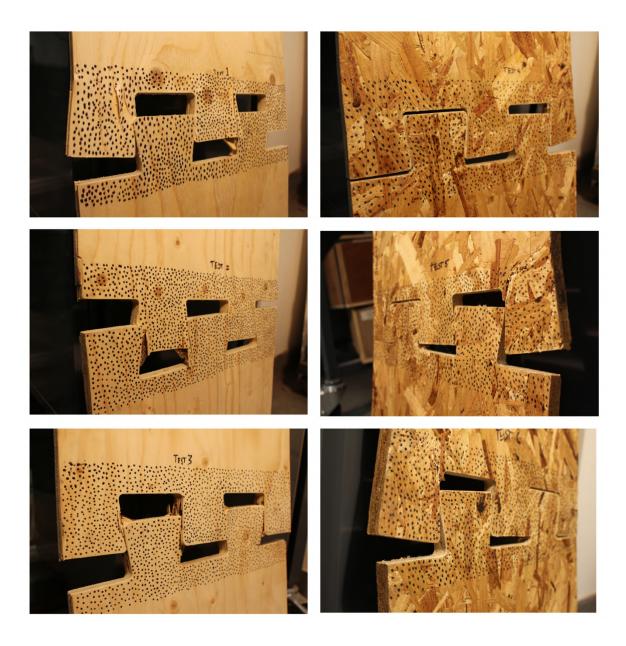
Jigsaw joint samples after failure (Left column: Plywood, Right Column: OSB)
